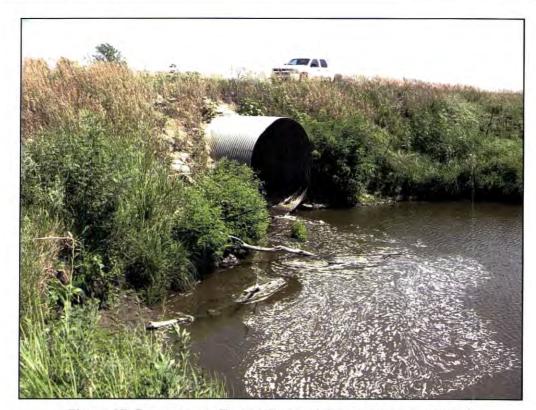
Downstream End of Firesteel Creek No. 20 Study Site
